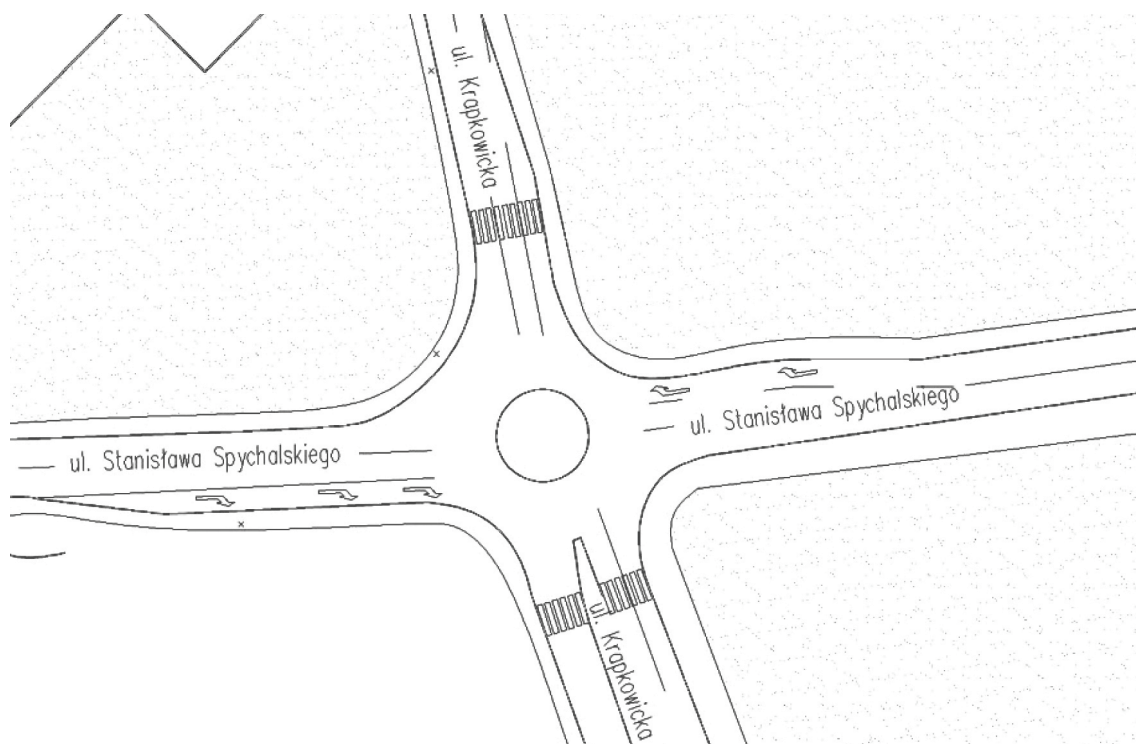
The crossroads of Stanisław Spychalski Street and Krapkowicka Street – current conditions.
